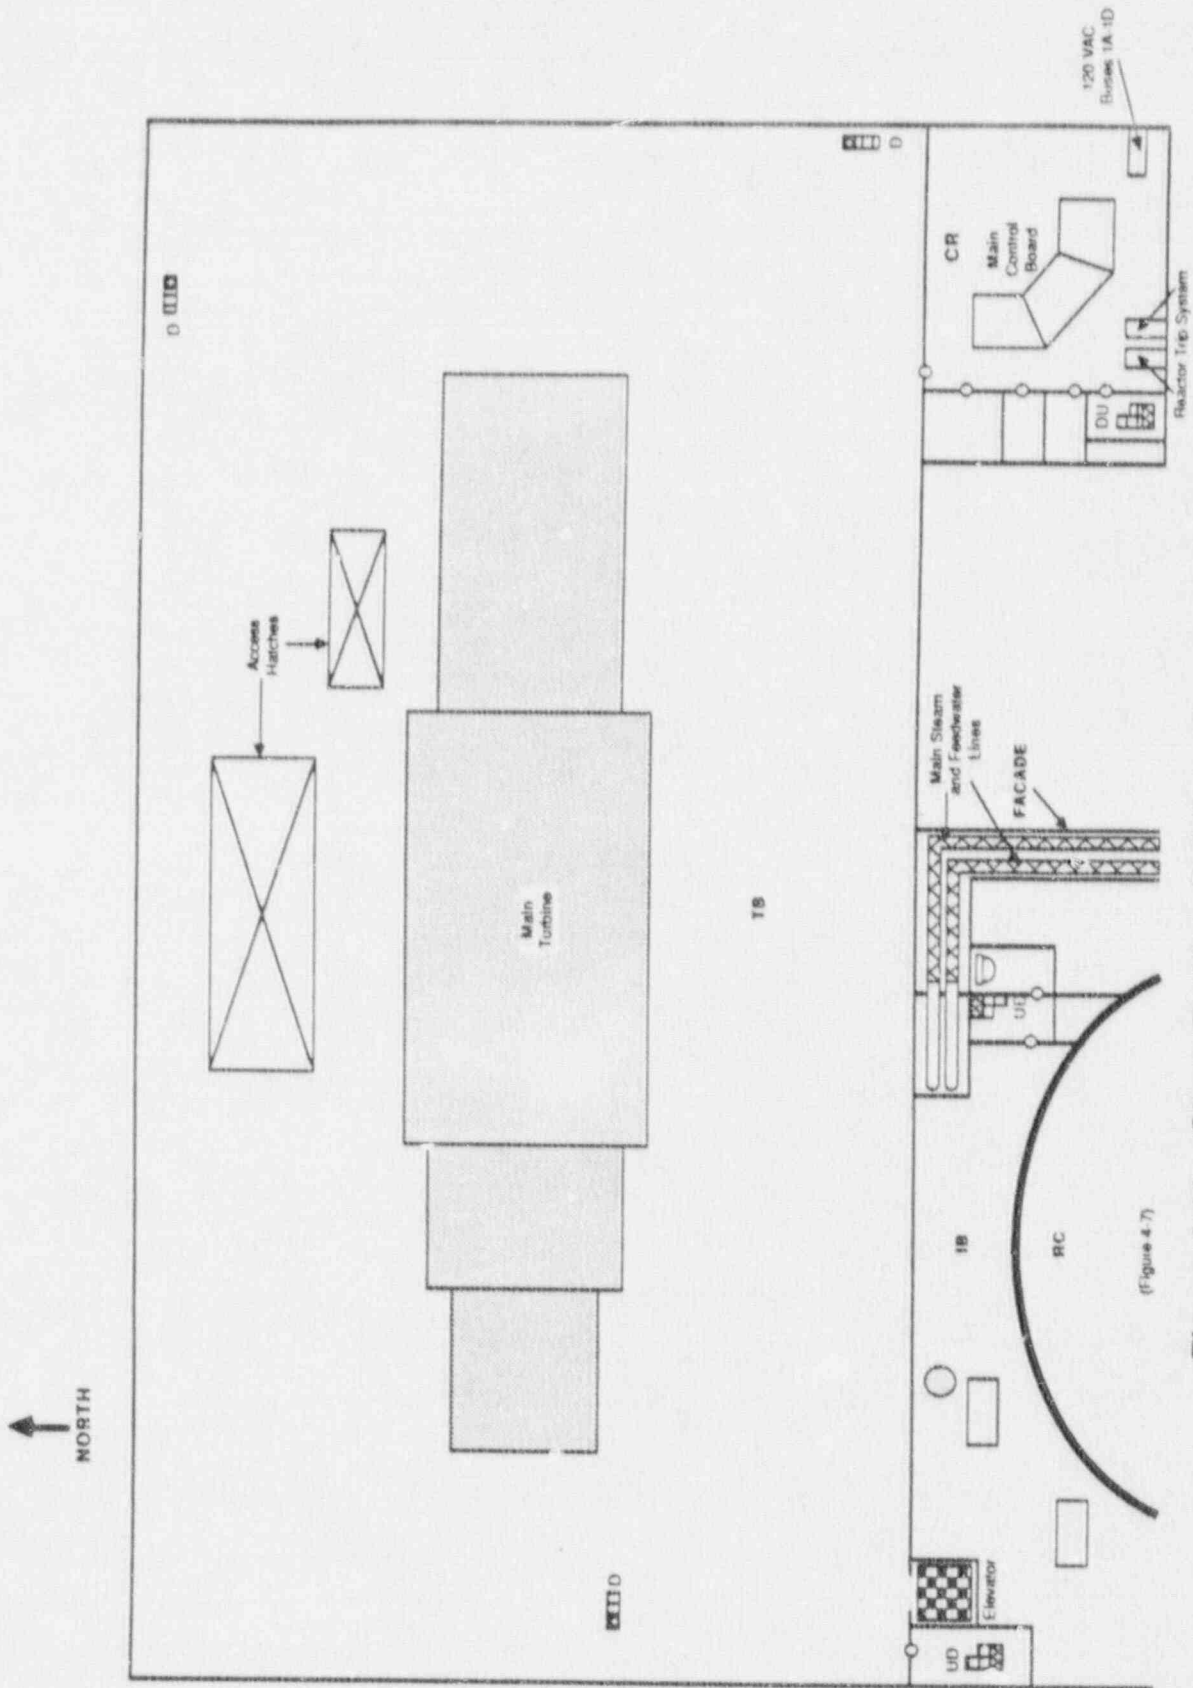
Ginna Turbine Building, Elevation 289'-0"
